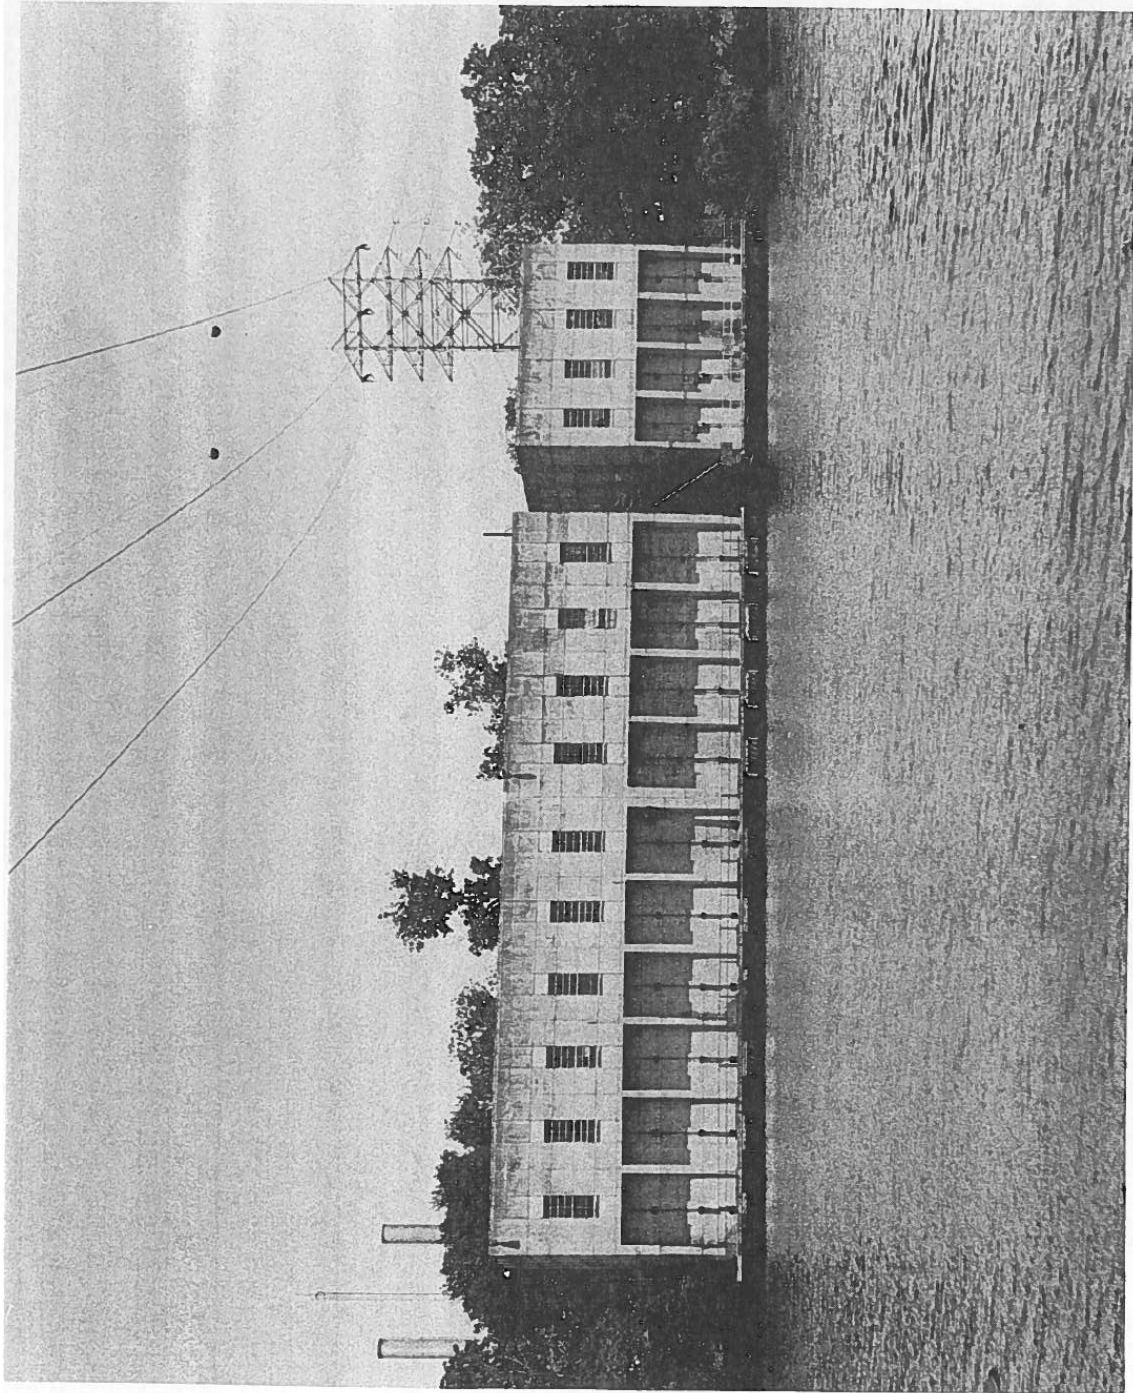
Turbine Generator Building, oblique view of north and west elevations, camera facing southeast
